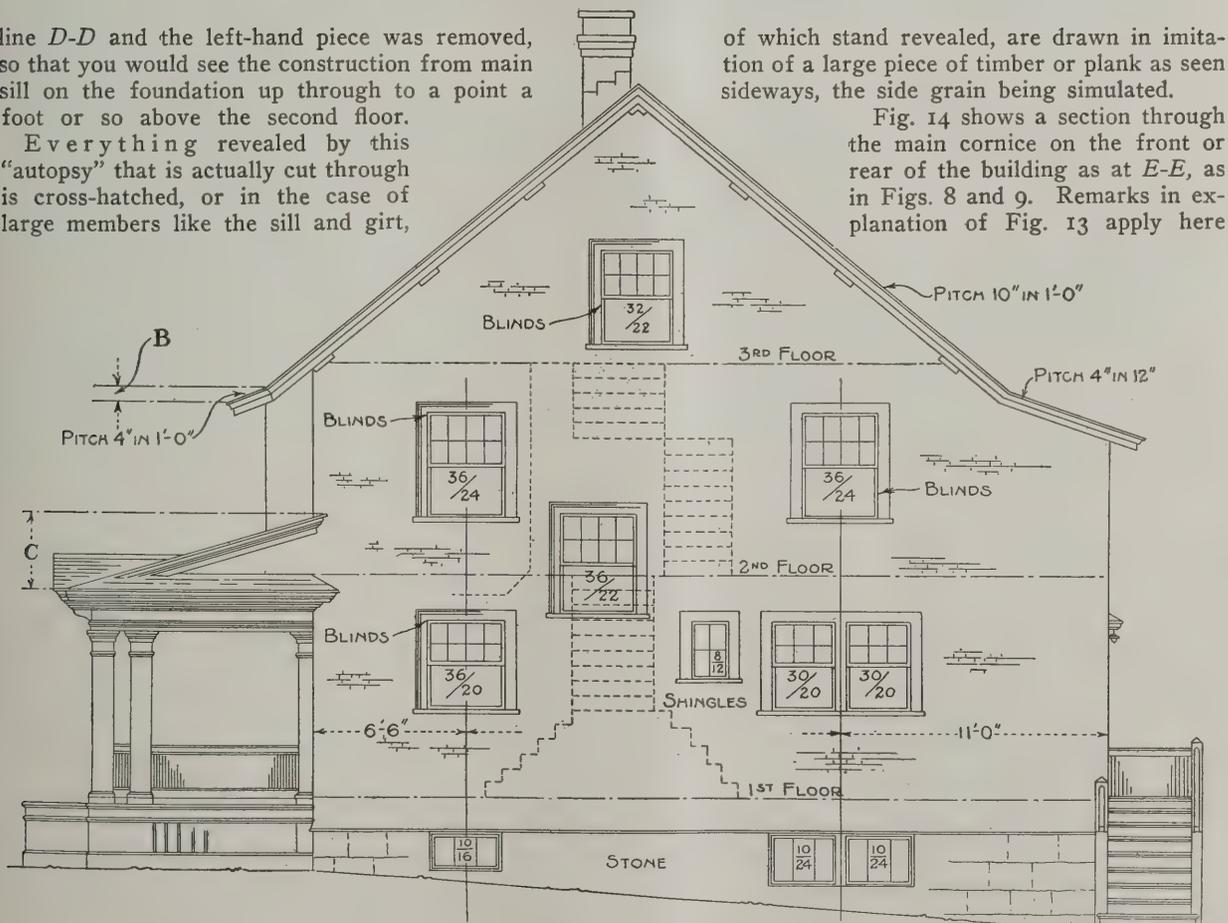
Right Side or Northwest Elevation—Scale 1/8-In. to the Foot
